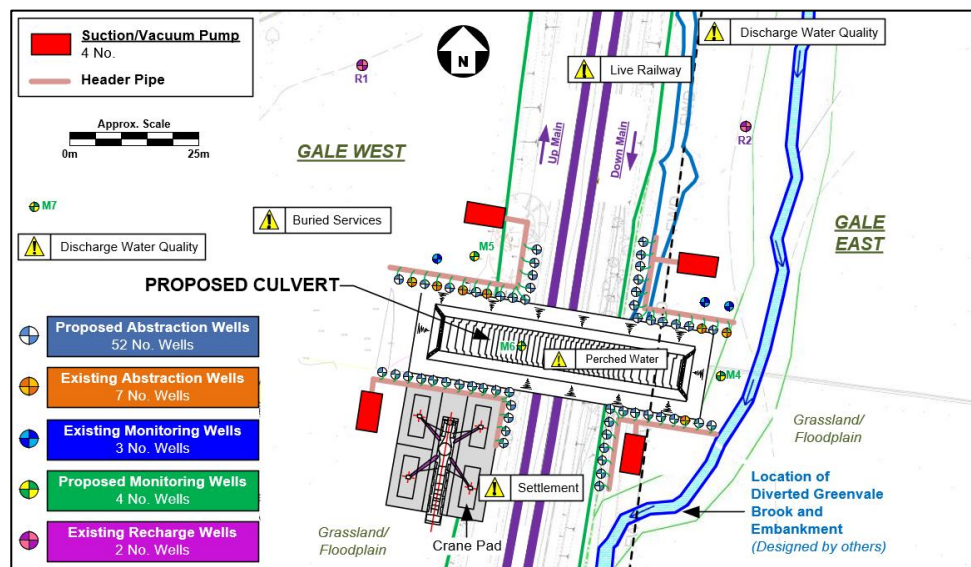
Site plan showing well locations and dewatering system pumping set up at the site.
